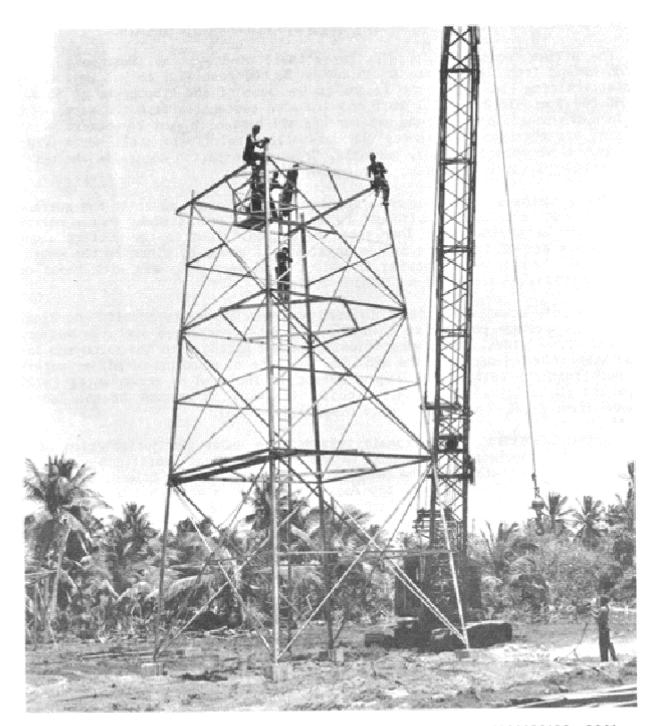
Erection of photo towers on Bikini, prior to CROSSROADS, 1946.
